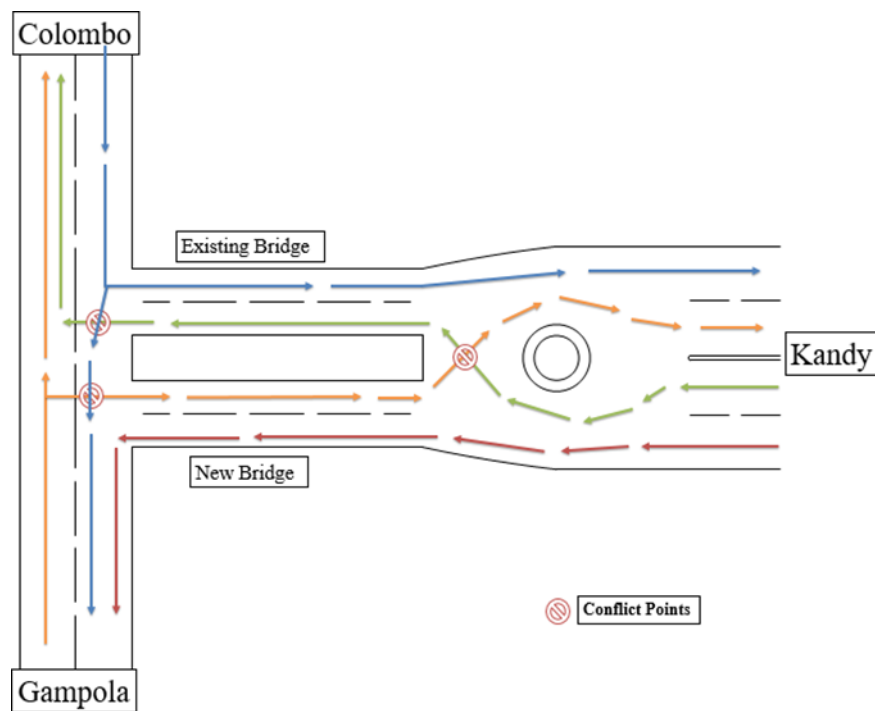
Sketch showing the new bridge, existing bridge and traffic directions in alternative 1
